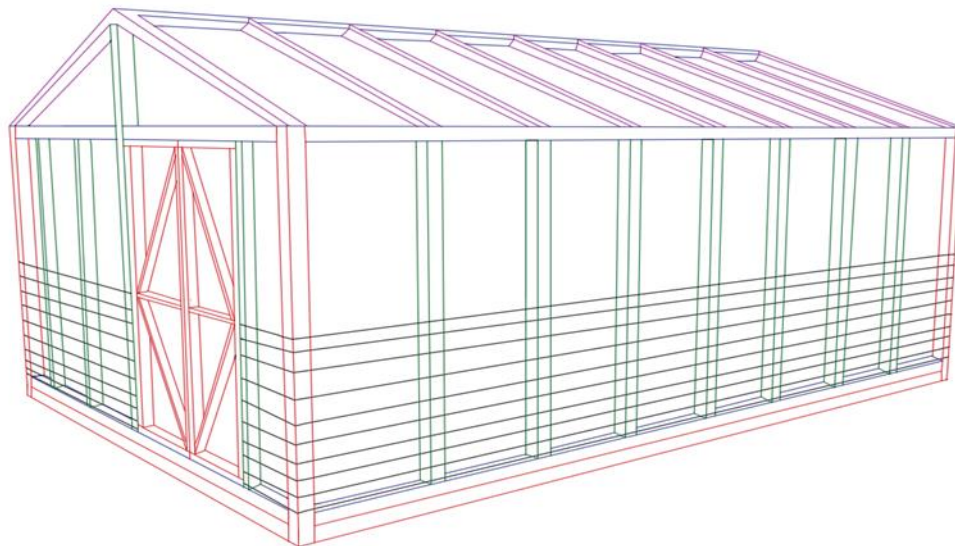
Greenhouse Design - Our design follows a post and rafter style, with insulation on the bottom 4ft. of the walls.
